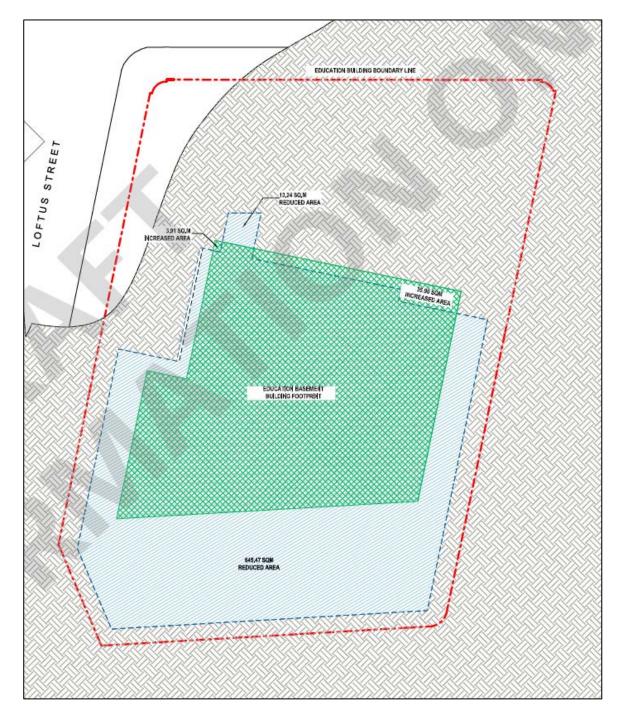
DEMOLITION OVERLAYED FLOORPLANS, EDUCATION BUILDING BASEMENT 1 (SOURCE: MAKE & RIDLEY 2018, DRAWING NO. SP-DA-G-2358)
